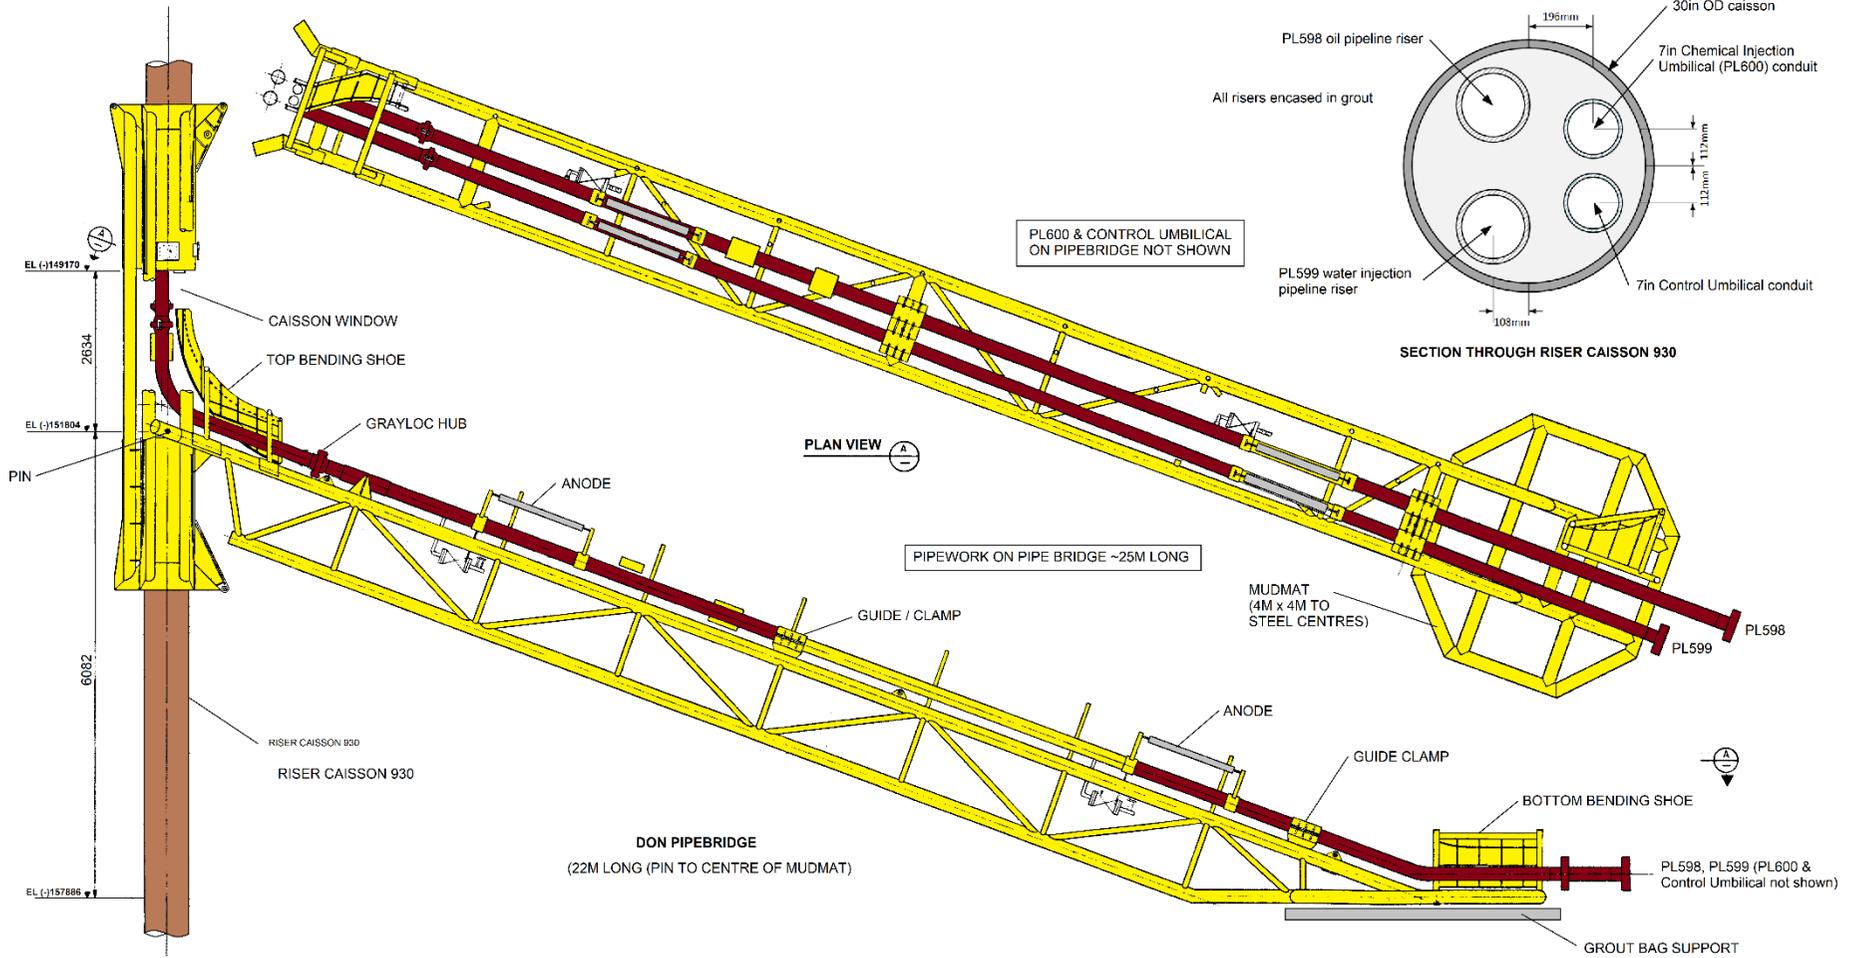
Don pipebridge (next to riser caisson 930 on Thistle jacket)
